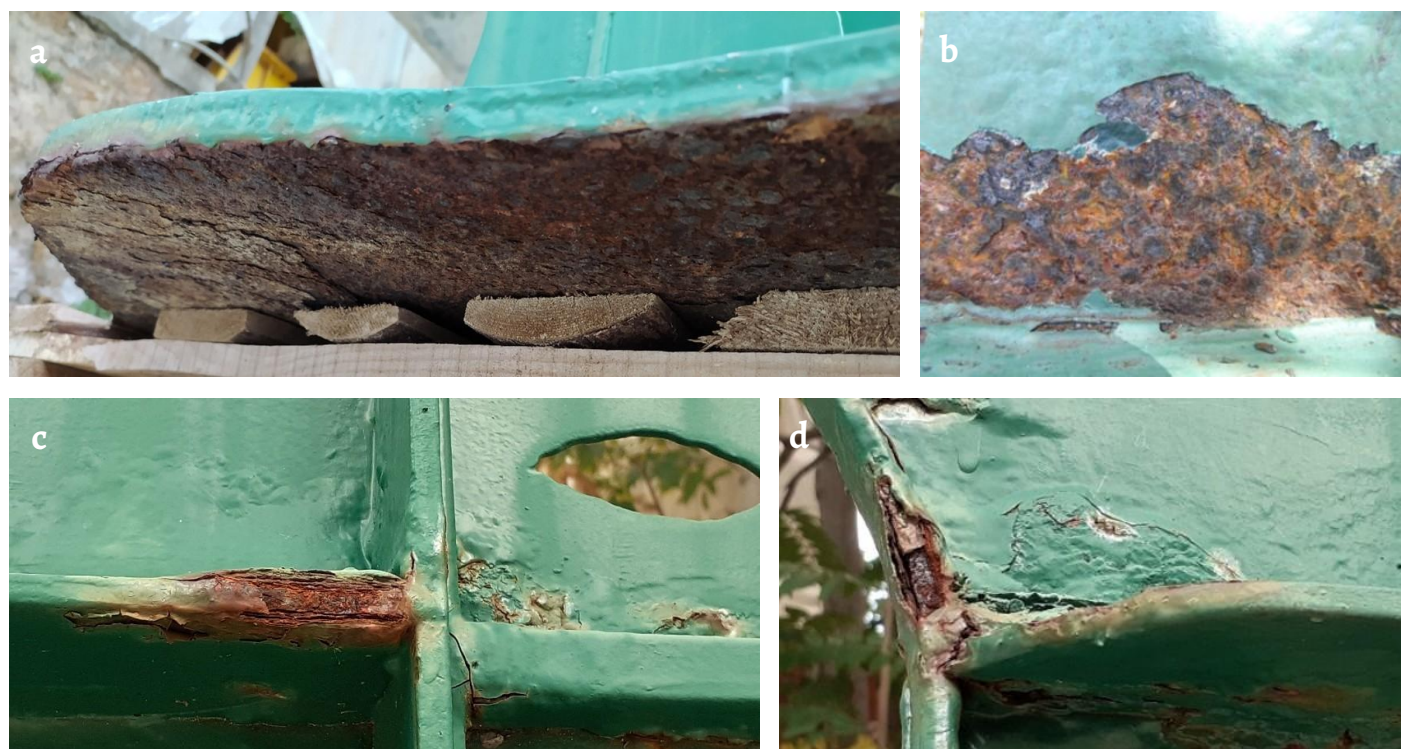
Corrosion types: *a-b*) uniform corrosion with formation of black and brown/orange corrosion products and stress mechanical cracking; *c-d*) bulk corrosion products in areas characterized by spalling and detachment of material.
